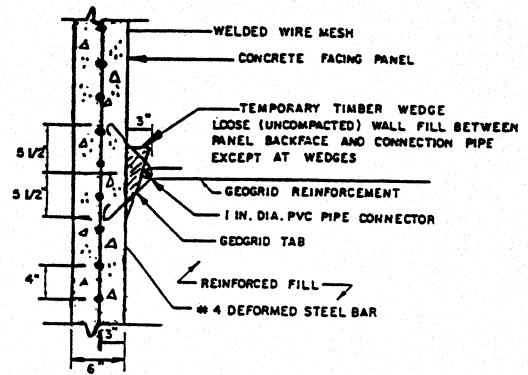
GEOGRID LOOPED CONNECTION USED ON THE TANQUE VERDE ROAD PROJECT
